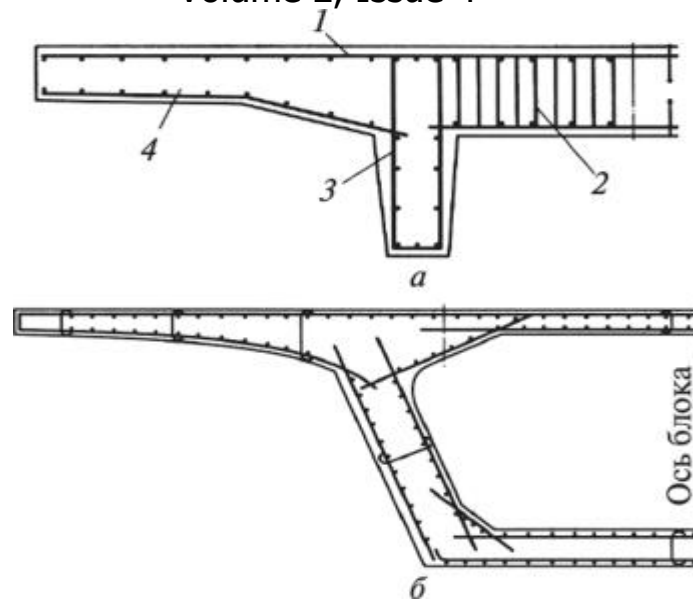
Scheme of reinforcement of plate-rib and box-shaped cross sections with non-stressed reinforcement: 1 - upper reinforcement grid of the carriageway slab; 2 - longitudinal reinforcement and transverse rib yokes; 3 - reinforcement frame of the longitudinal beam; 4 - reinforcement grid of the carriageway console
